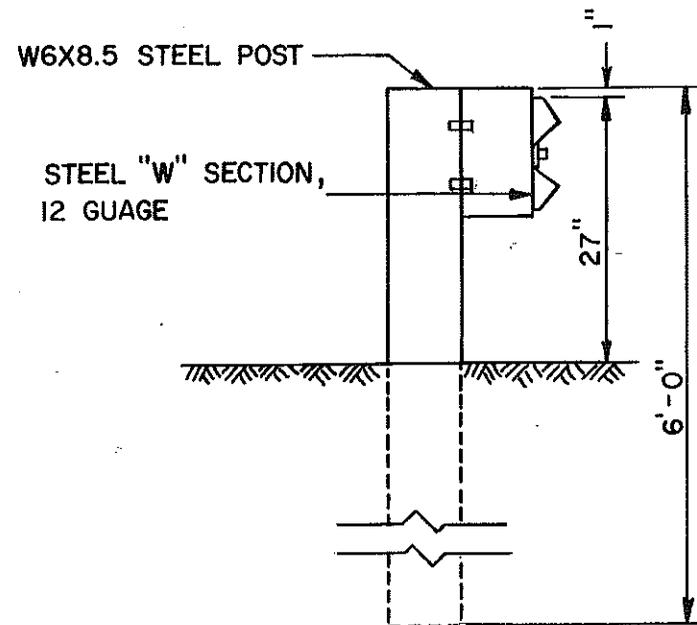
<b>STANDARD DETAIL</b>	<b>STEEL GUARD RAIL</b>	DETAIL NO. 135-1
